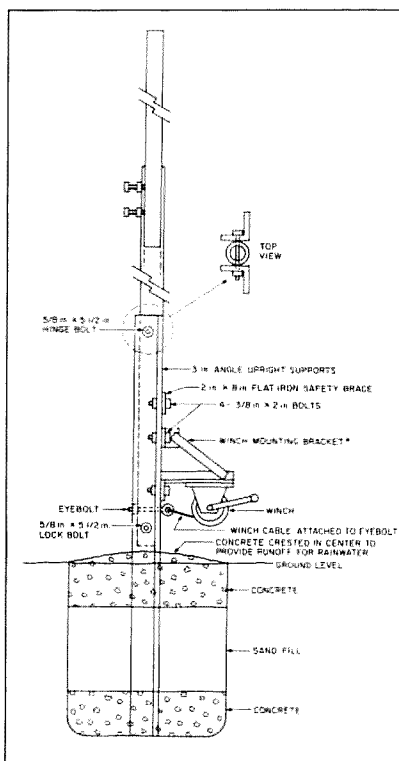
B. Side view of mast-supporting angle brackets and winch installation.
